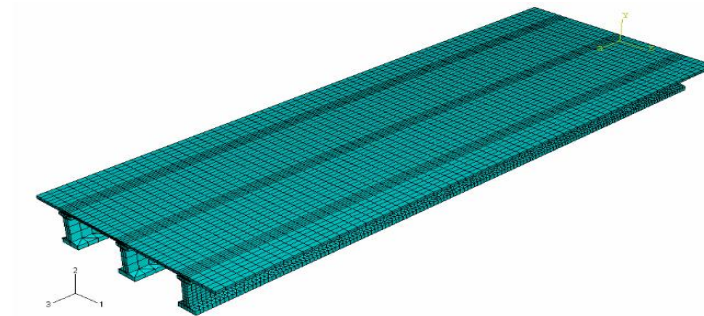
FE mesh of the three girder bridge (McLean, 2007)
